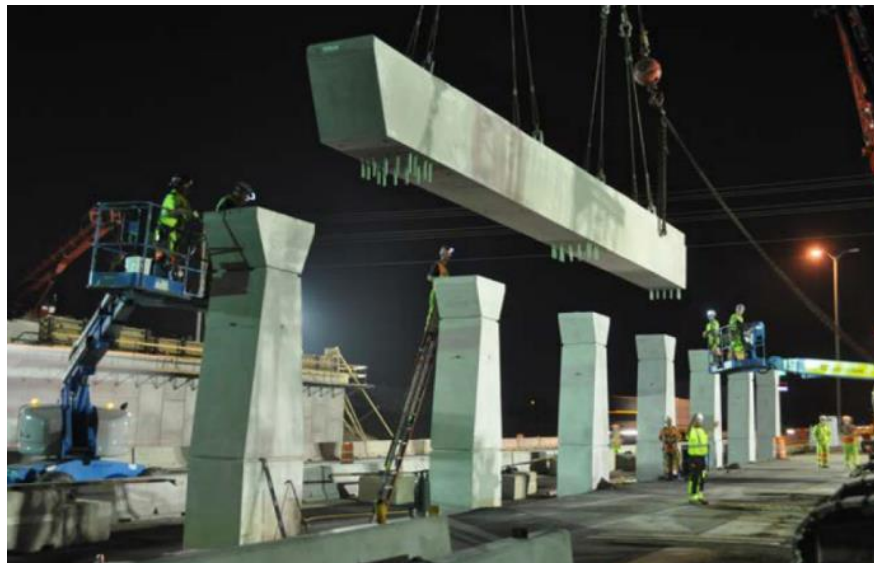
Pier cap erection in Rawson Avenue Bridge (Olivia 2014)
